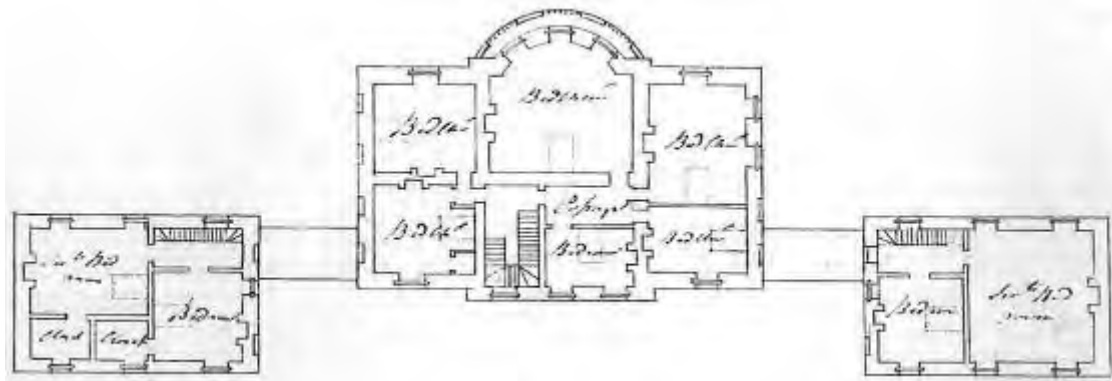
Proposed plan of bedroom floor Robert Adam July 1790 SJSM
